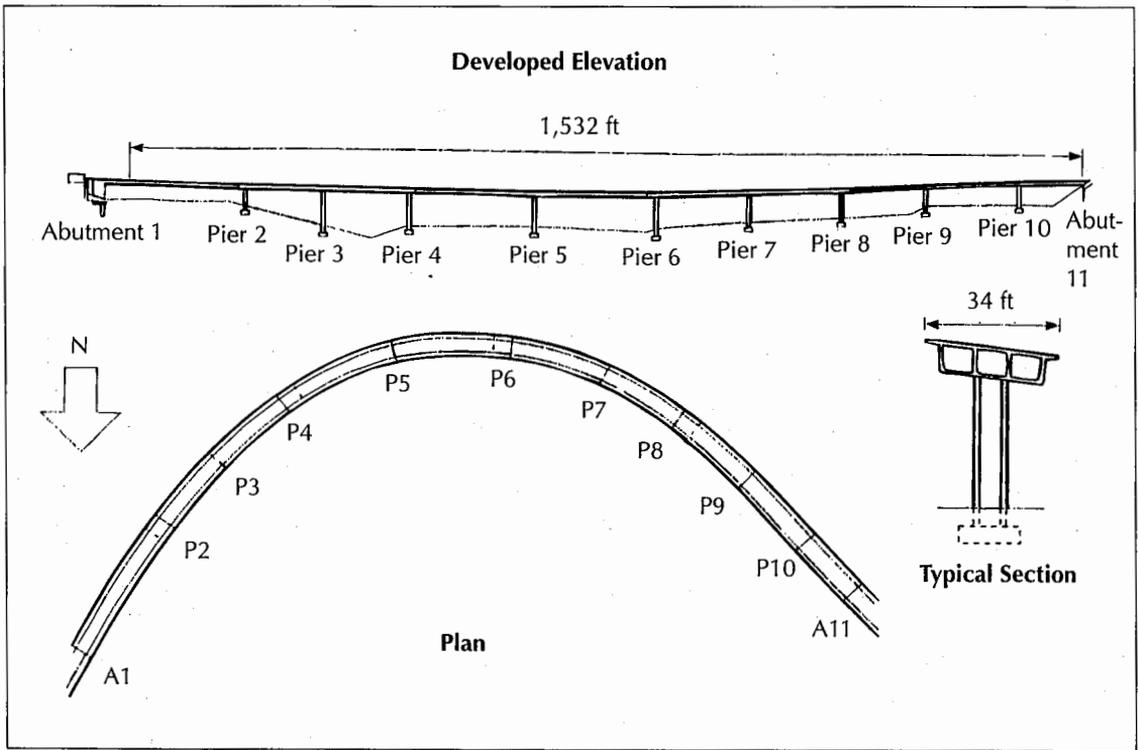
General plan and elevation for the SR14/I-5 north connector.
